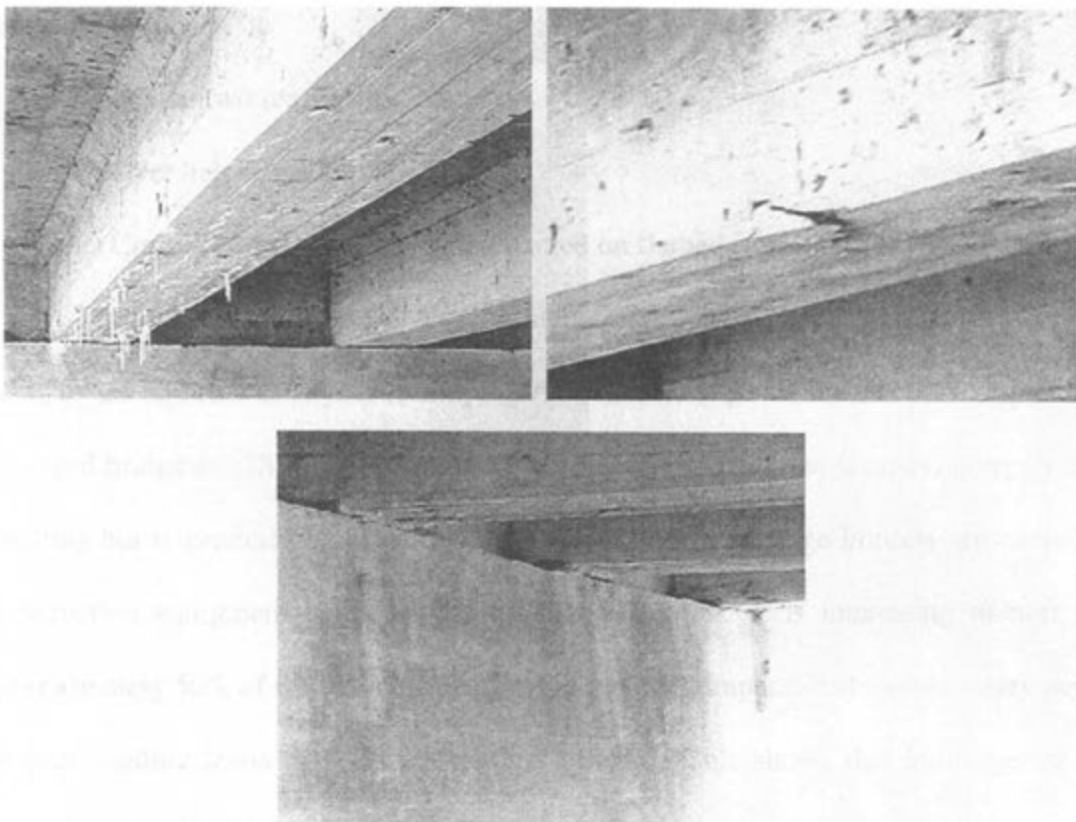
Cracked Concrete Beams (Courtesy of Calhoun County Road Commission, MI, 2004)
